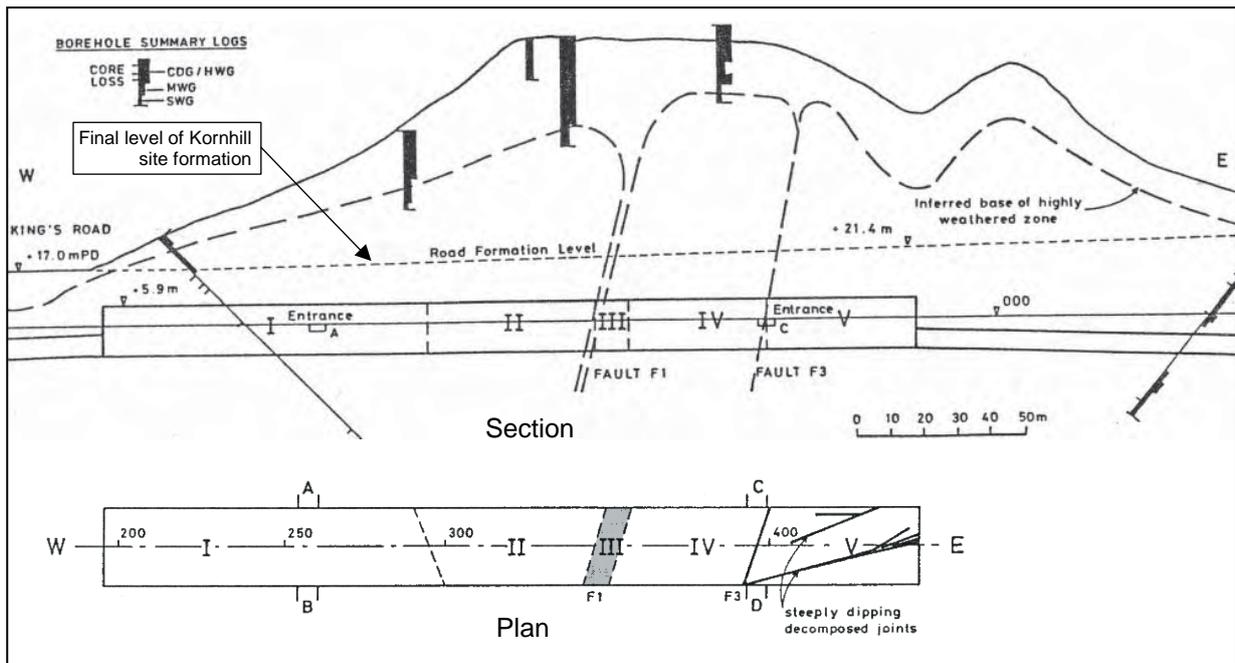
Longitudinal section and plan of Tai Koo MTR cavern showing zonation (I to V) based on rock mass characteristics (Sharp et al., 1986)
